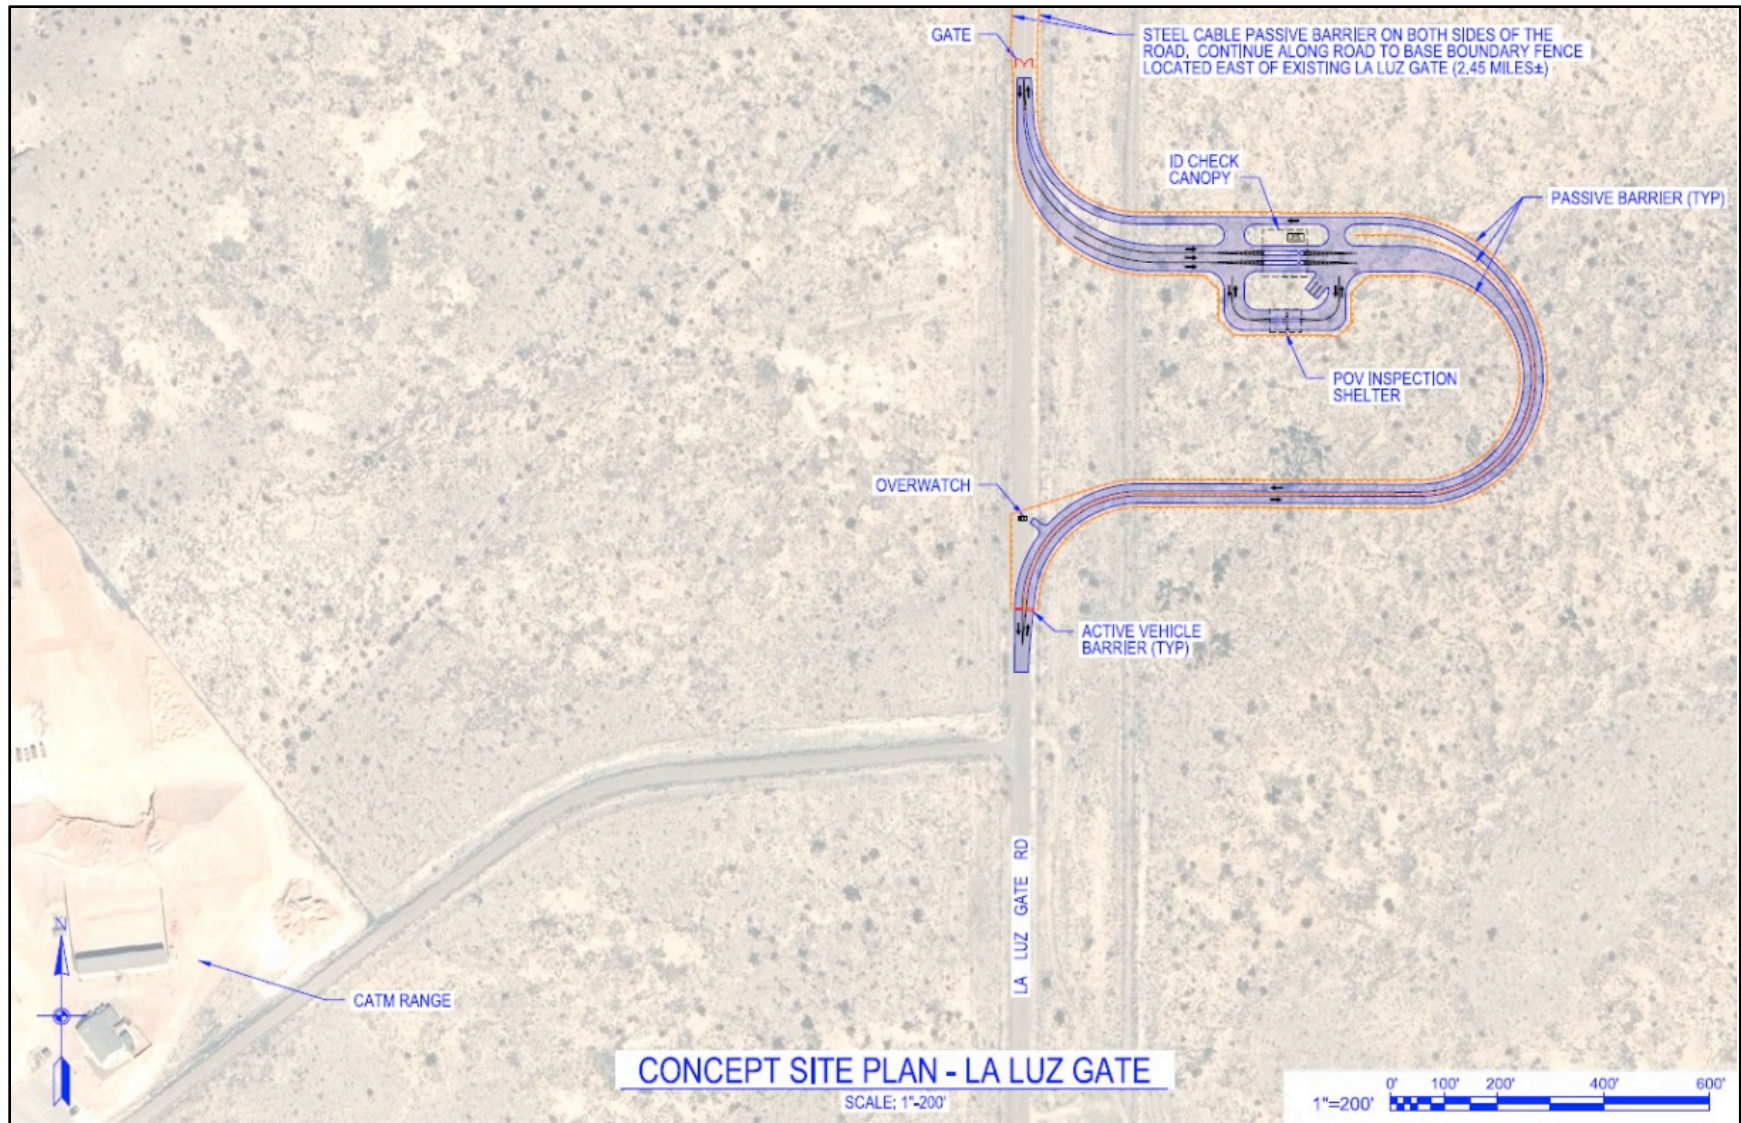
Proposed Site Plan for the La Luz Gate Relocation
